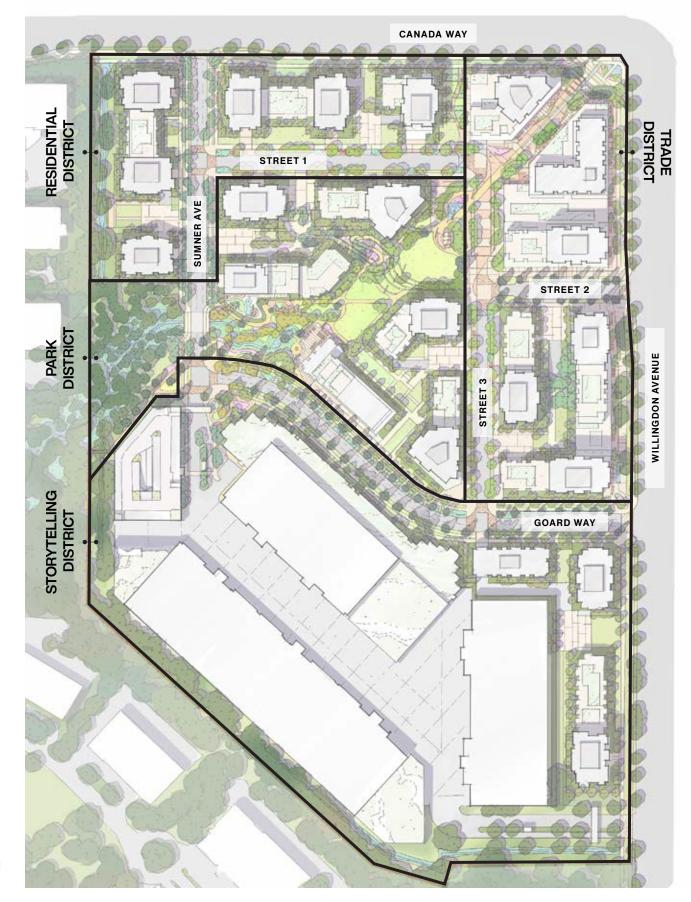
ILLUSTRATIVE SITE PLAN
